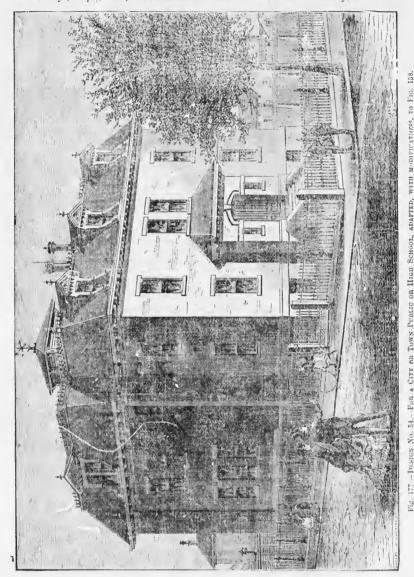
represents a plain, substantial brick building, adapted to a public or high school in a town. The engraving is that of the Capen Primary School, creeted in South Boston, Massachusetts. The interior plans a lapted to it will be found on pages 135, 136, and 150, Figs, 144, 145, 146, and 167.
